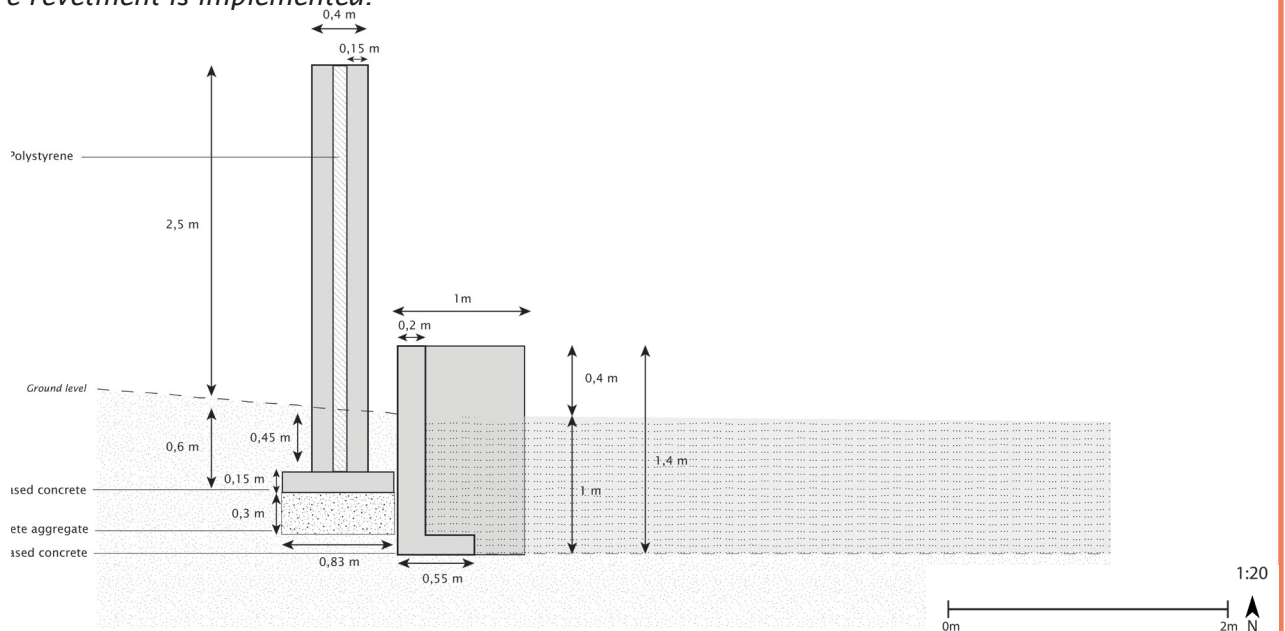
Technical section Revetment. The concrete poles in combination with the concrete revetment.
